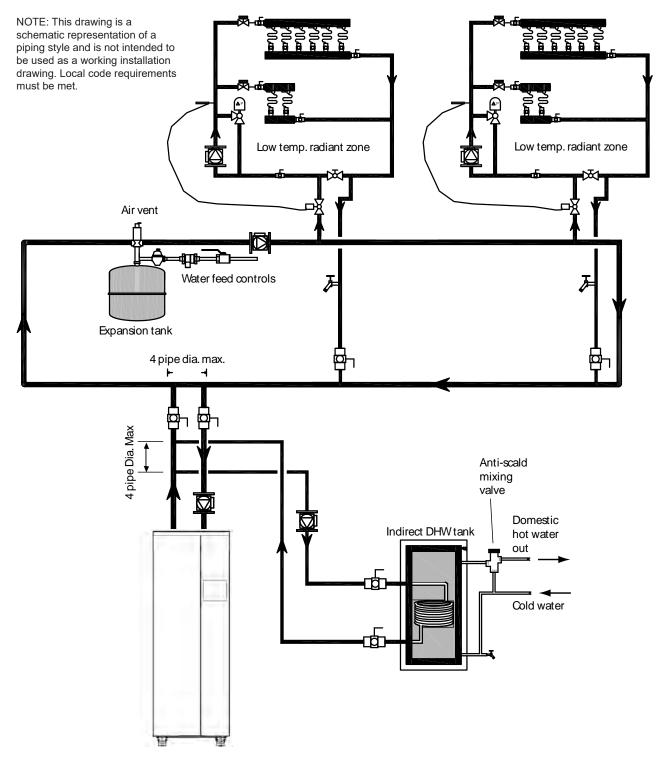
Boiler Piping — Single Boiler with Low Temperature Zones and Indirect DHW Tank Indirect tank directly off of boiler
